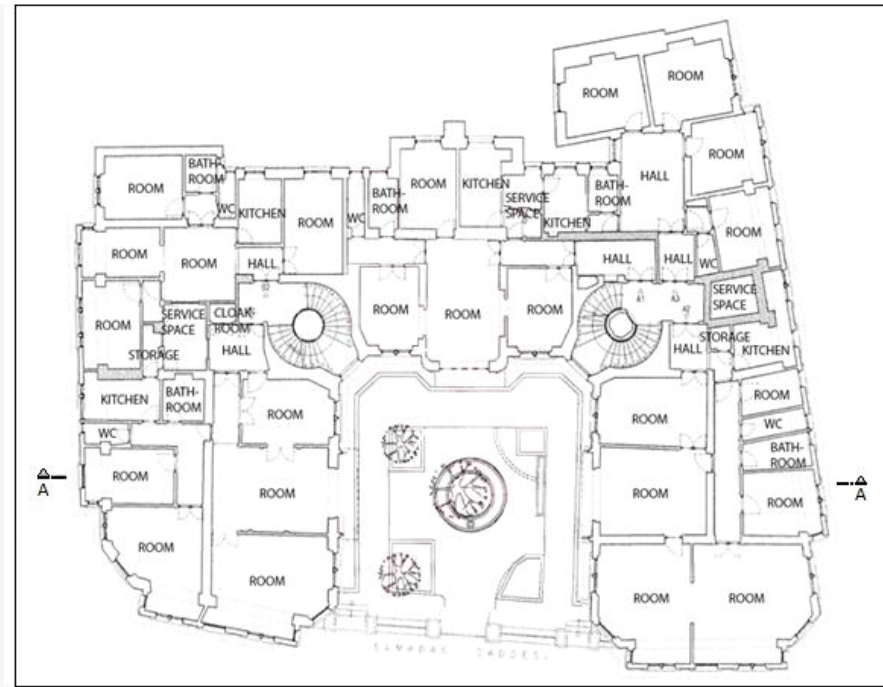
Normal floor plan of Arif Pasha Apartment ( Source: Öğrenci 1998)
